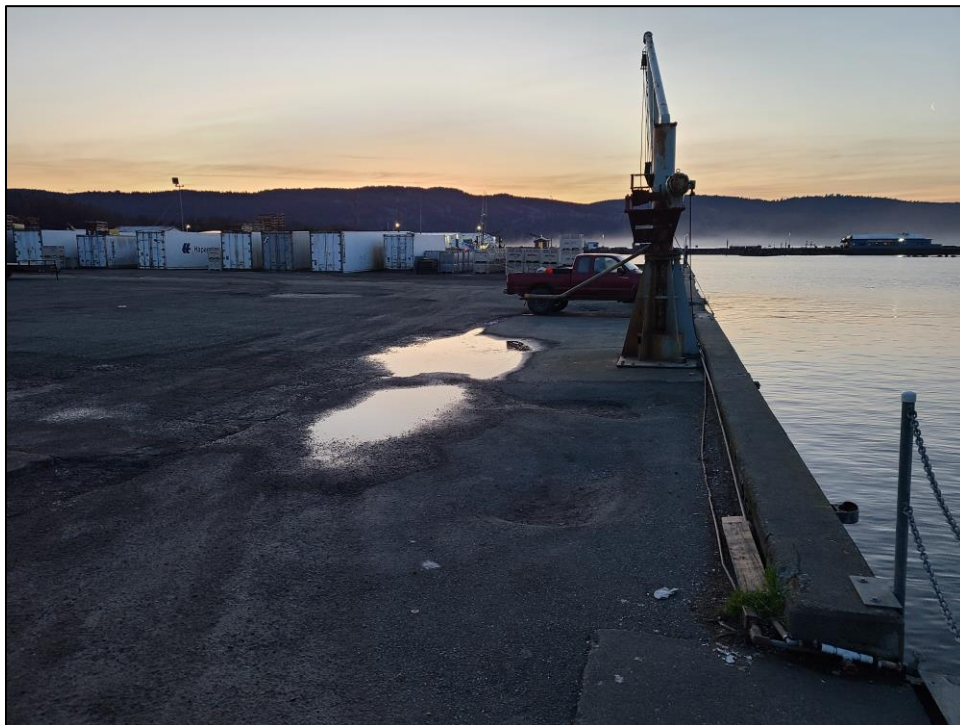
Yard Area Adjacent to the Bulkhead, Looking East
